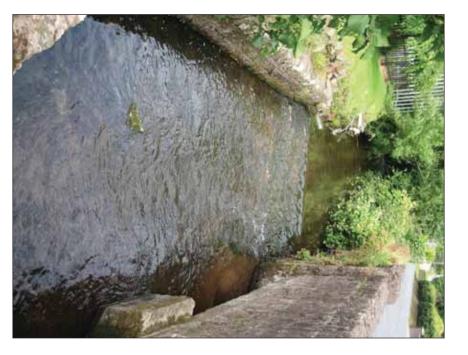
Glenmore Stream eastern section with Brooklodge Grove Road to south (right). Opening to the rectangular culverted channels are visible at bottom right, looking east
